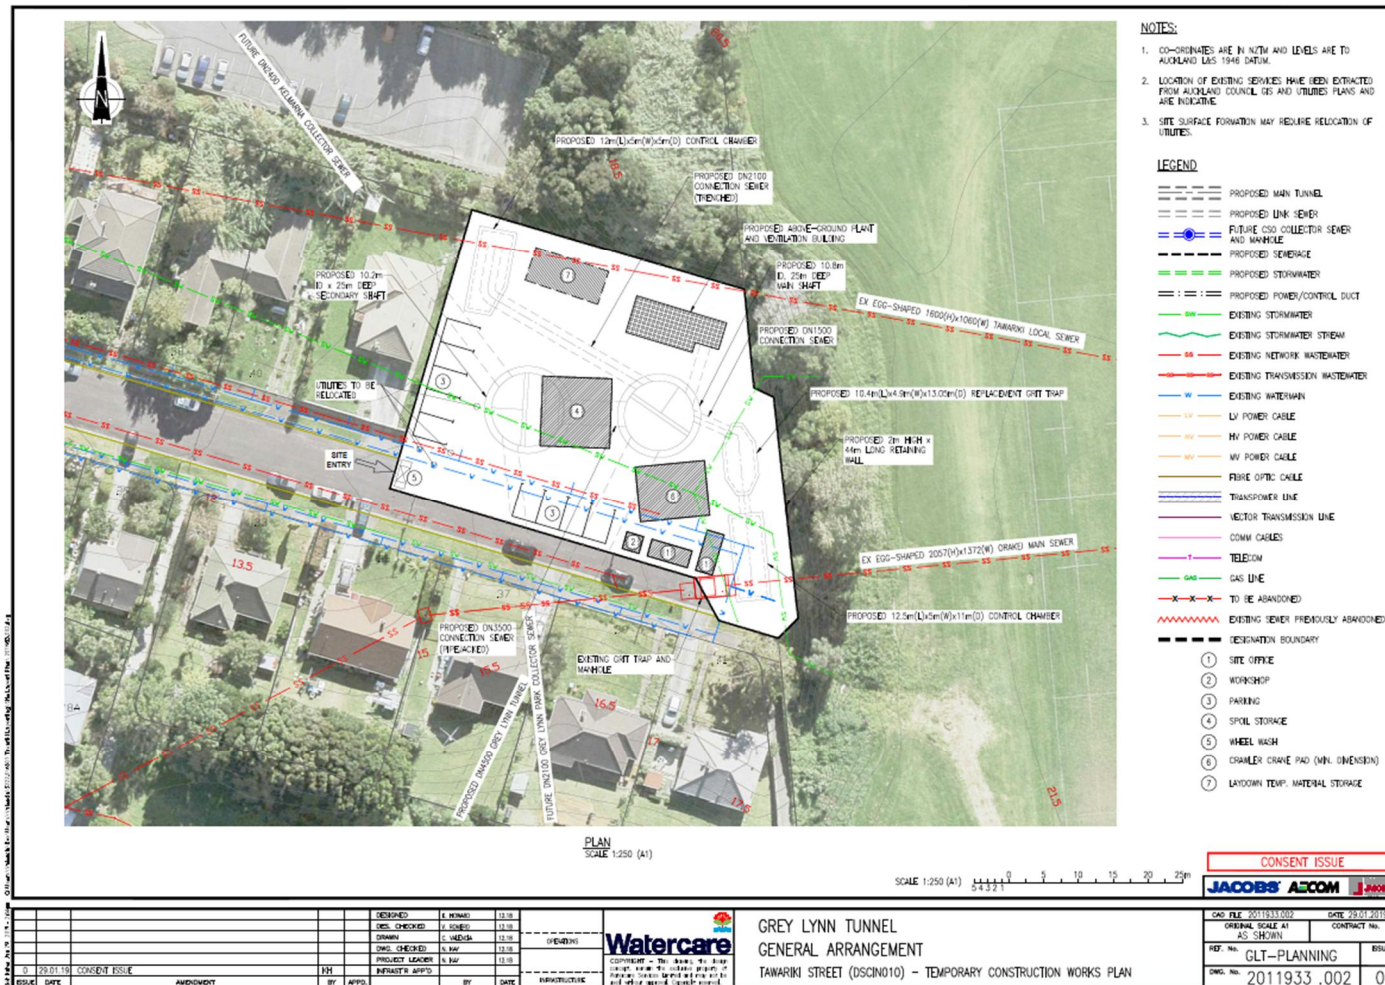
Tawariki Street layout plan of proposed works (source: Watercare)
